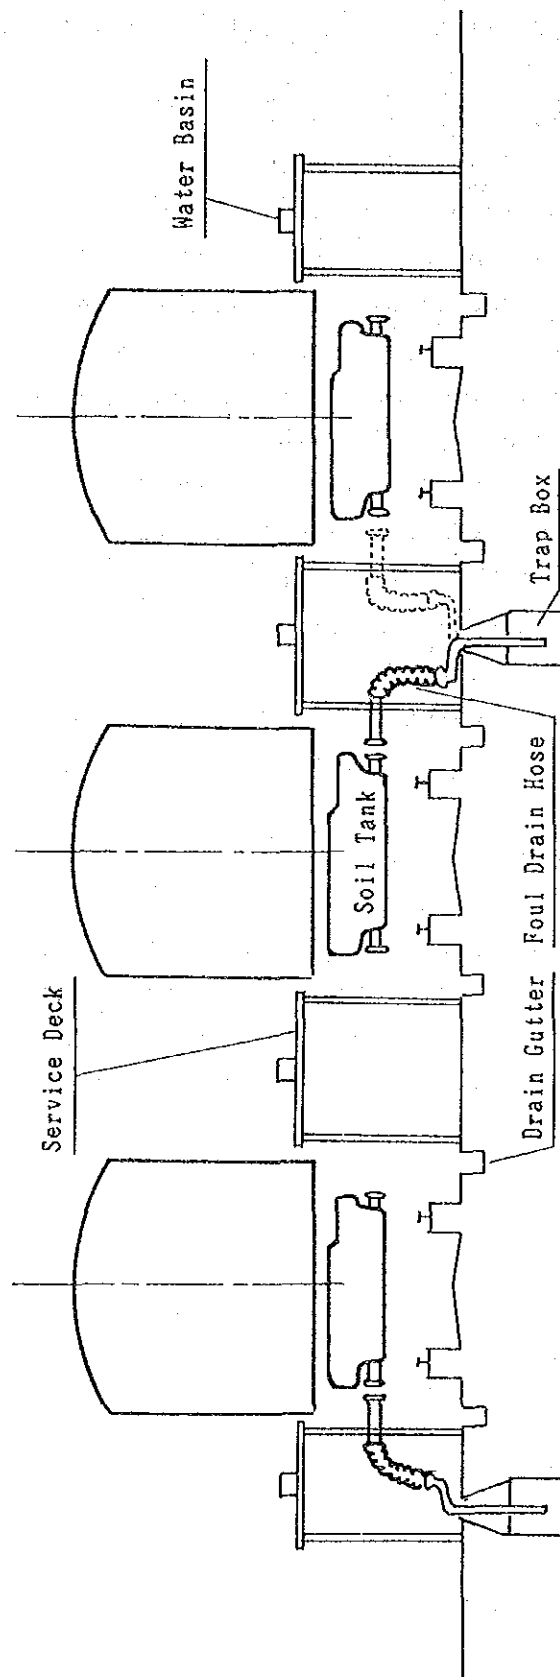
Train Washing Deck & Foul Water Discharge Arrangement
